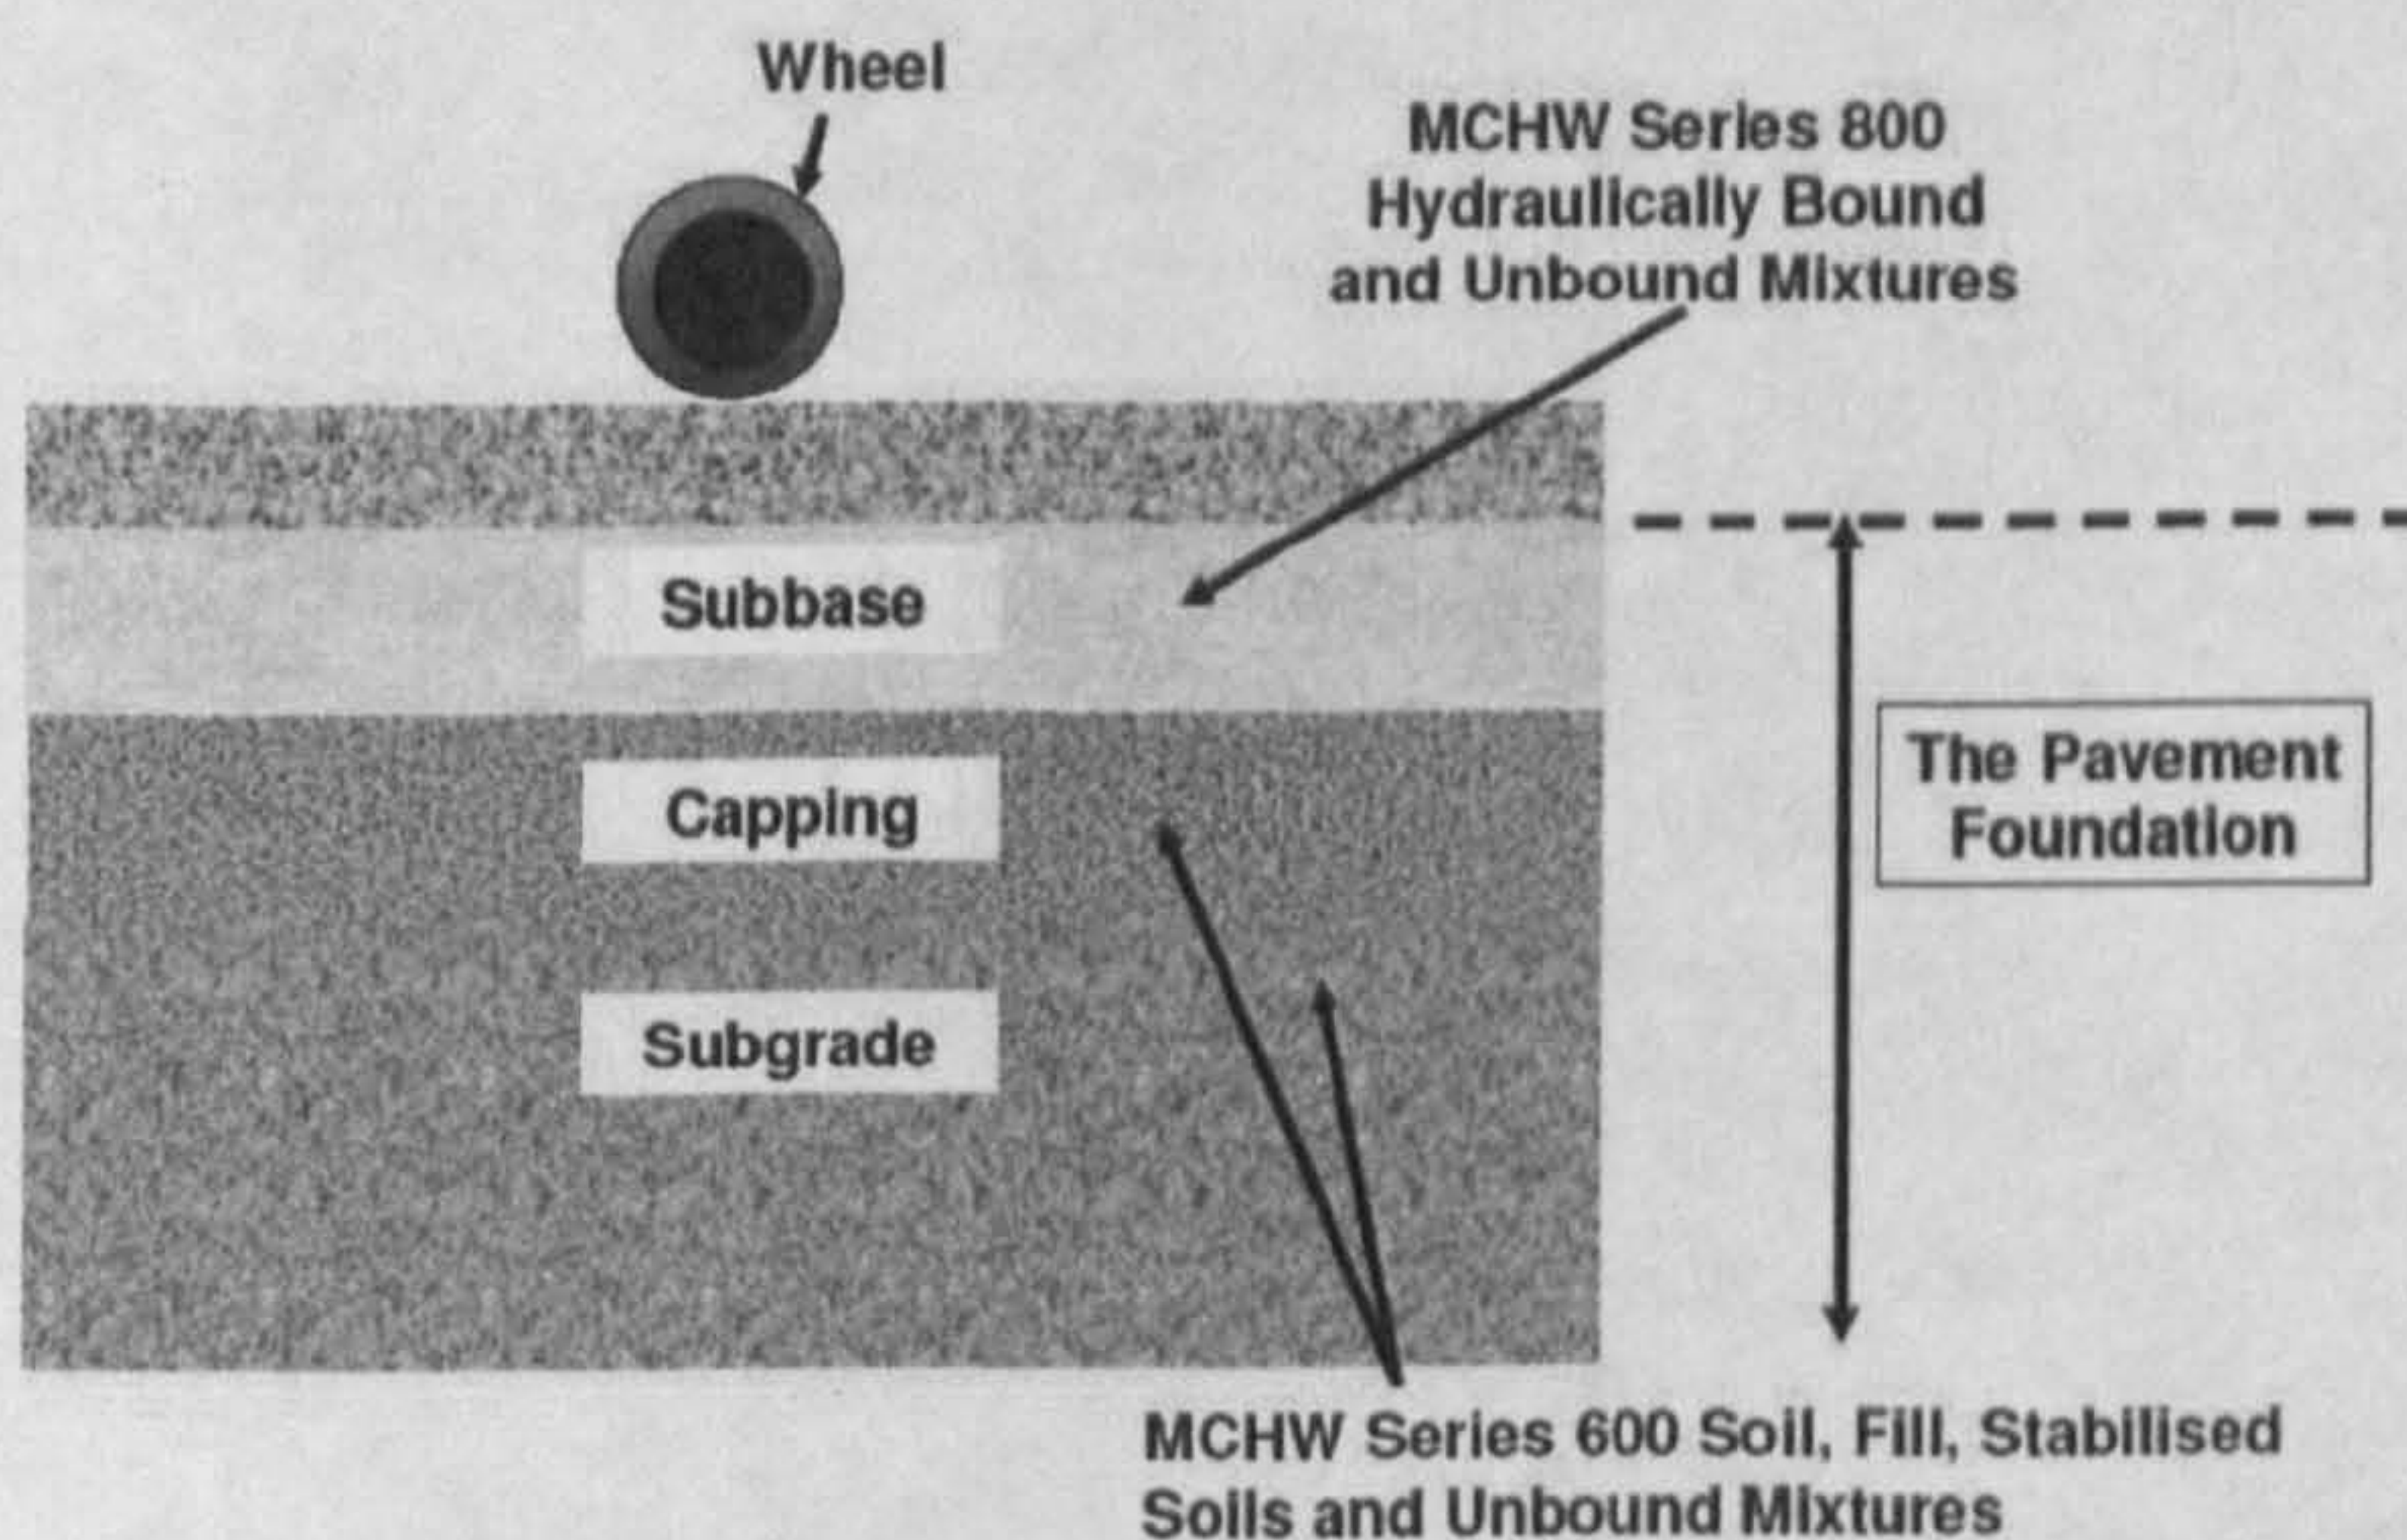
Definition of the pavement foundation and material options (From Edwards, 2007)
